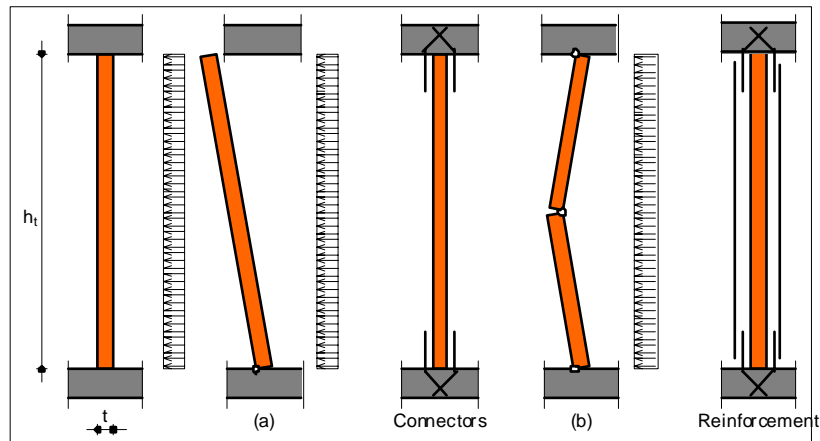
Reinforcement with FRCM to prevent out-of-plane collapse mechanisms.
